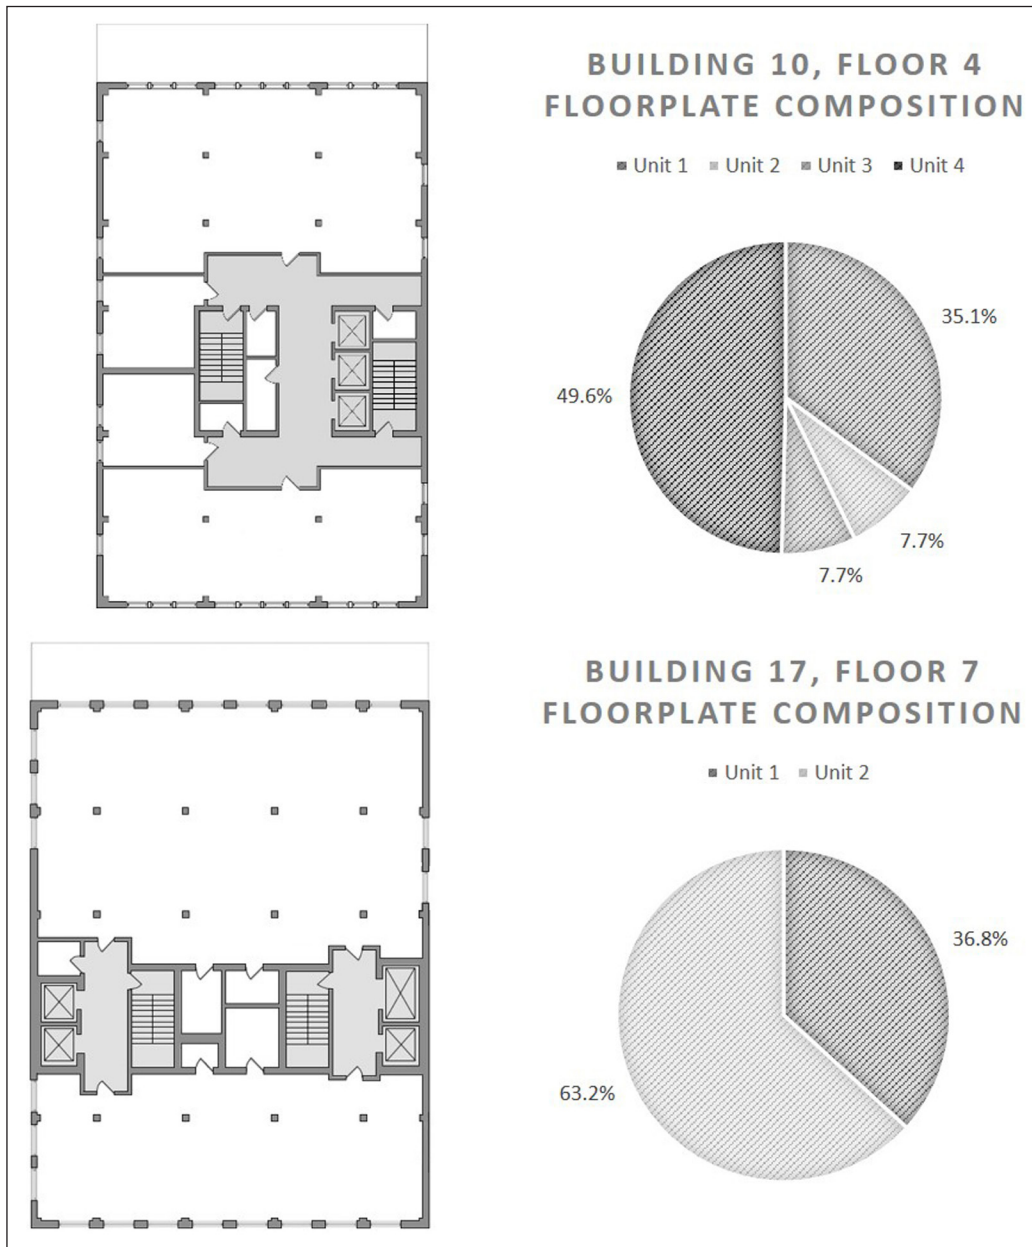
(top) Pie chart showing the percentage of the floorplate occupied by floor 4 units of building 10 upon initial construction in 1921; and plan of said floor. (bottom) Pie chart showing the percentage of the floorplate occupied by floor 7 units of building 17 upon initial construction in 1915; and plan of said floor.
